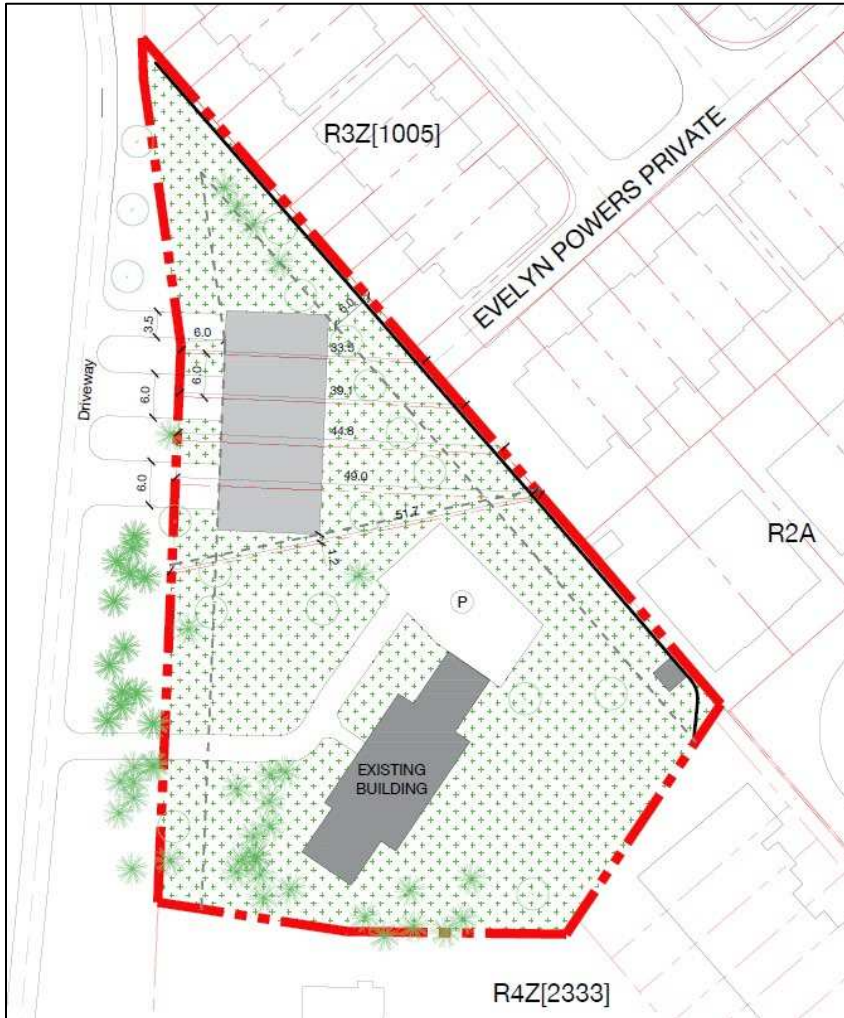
Concept Plan P2 showing a block of five (5) townhouses on the subject property
